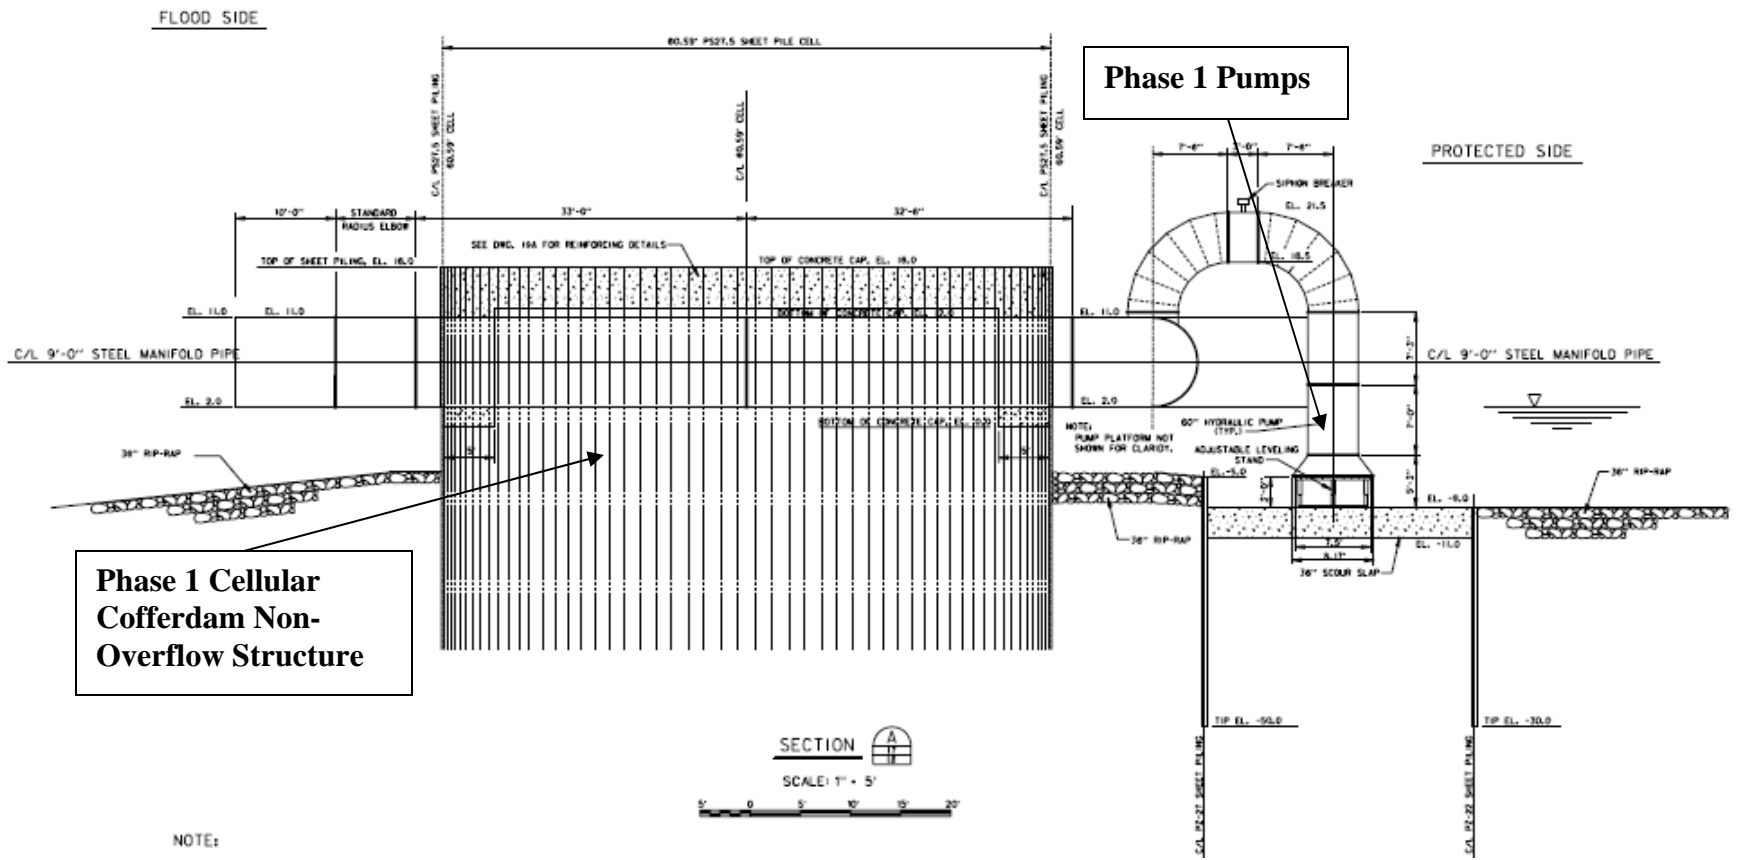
Orleans Avenue West Bank Pump Platform and Discharge Pipe Section
